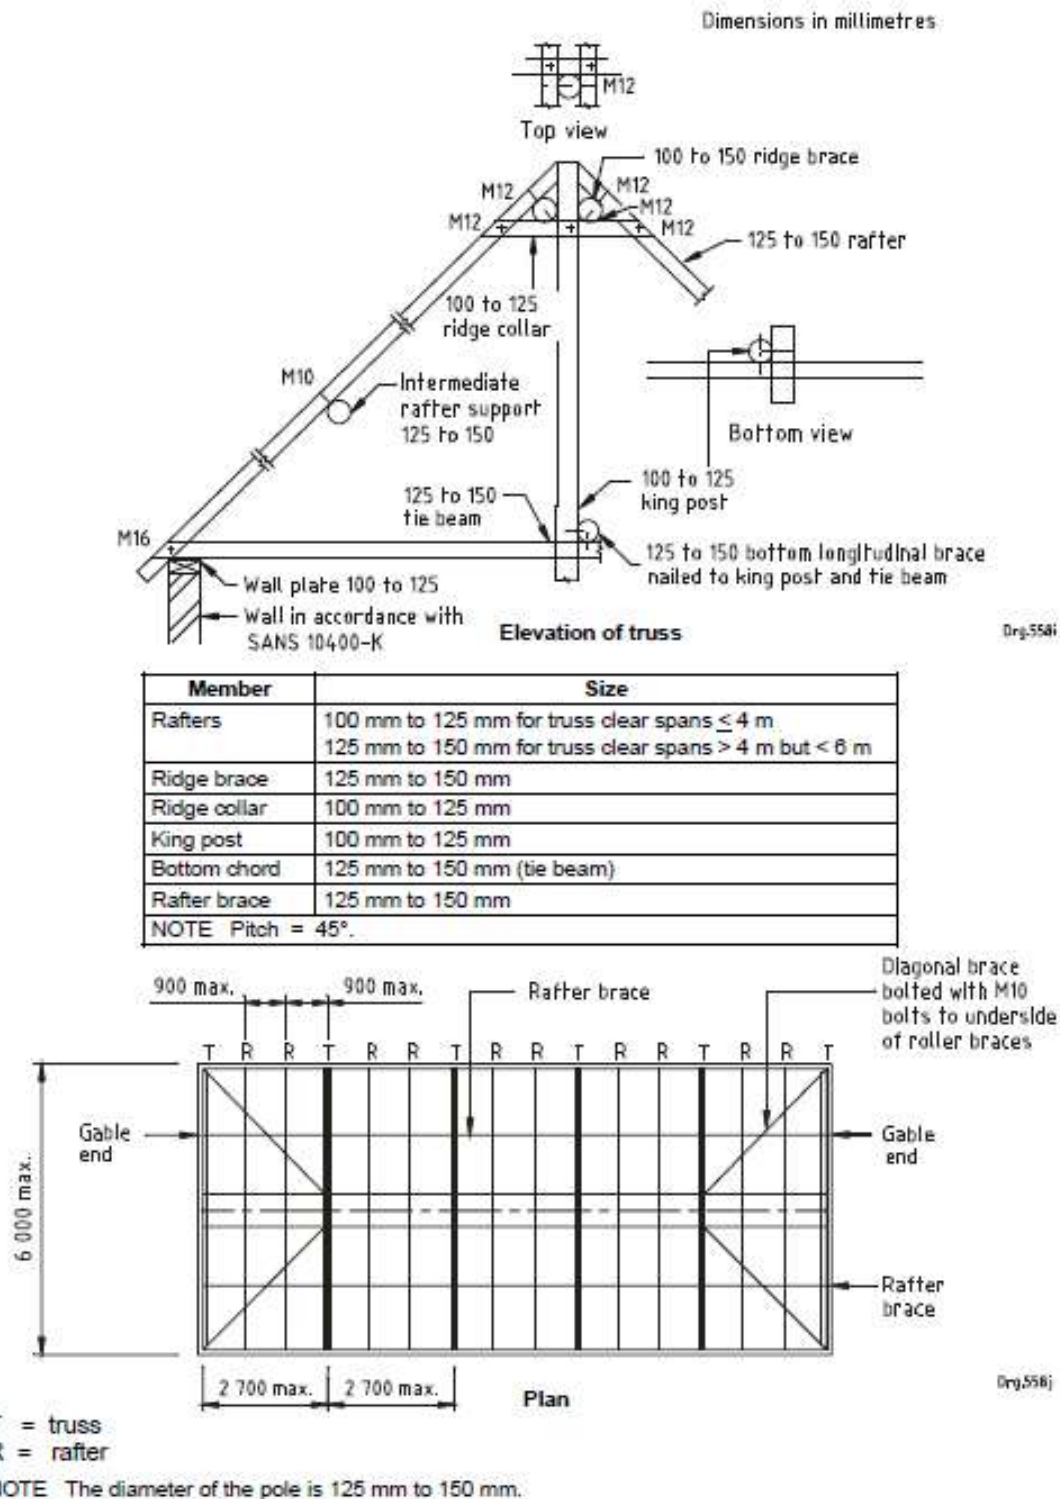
Truss for thatch roofing in gable-to-gable rectangular buildings that have a clear span that does not exceed 6,0 m
